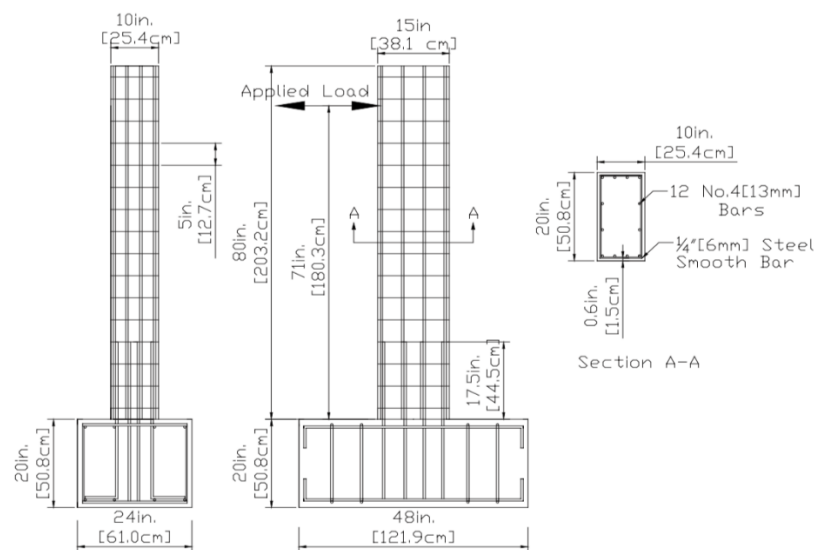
Details of specimens tested by Elgawady et al. [37].
